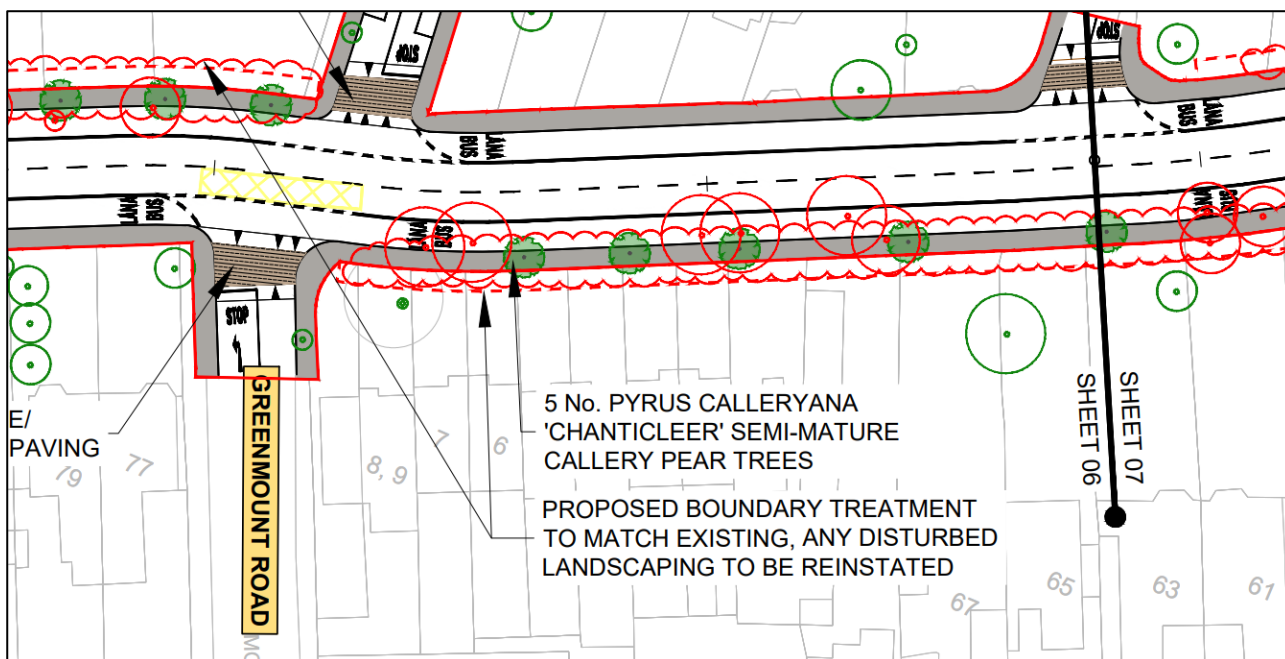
Landscape General Arrangement Drawings at Terenure Road East
